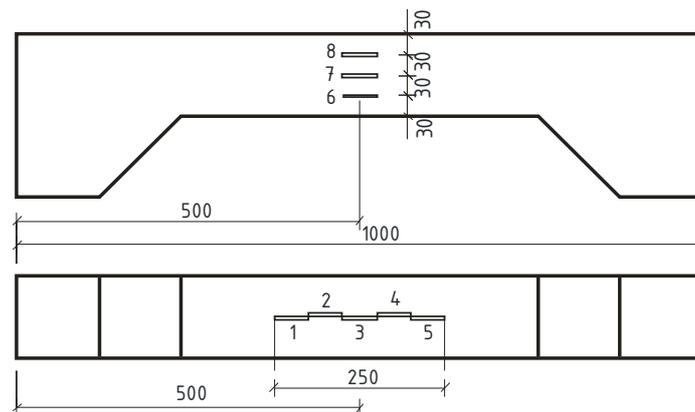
The scheme of arrangement a strain sensors on the concrete surface
